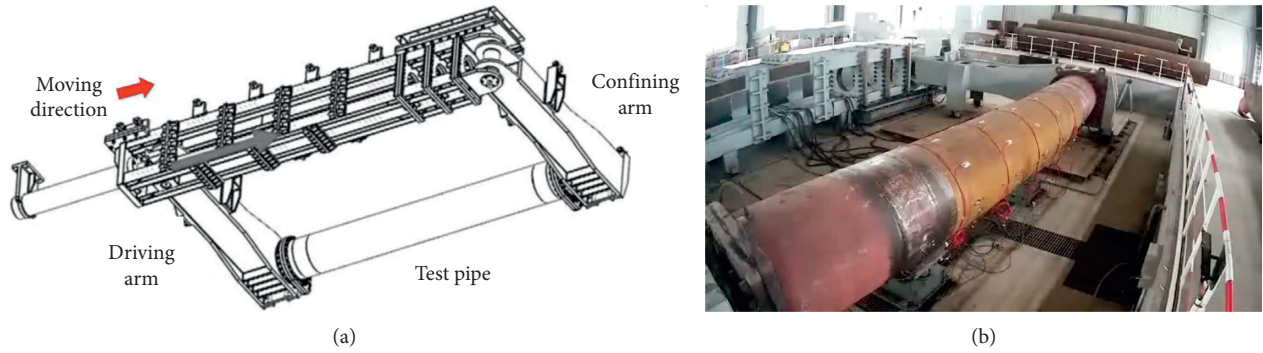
Layout of large-scale pipe mechanical loading experiment: (a) schematic diagram; (b) site layout.
